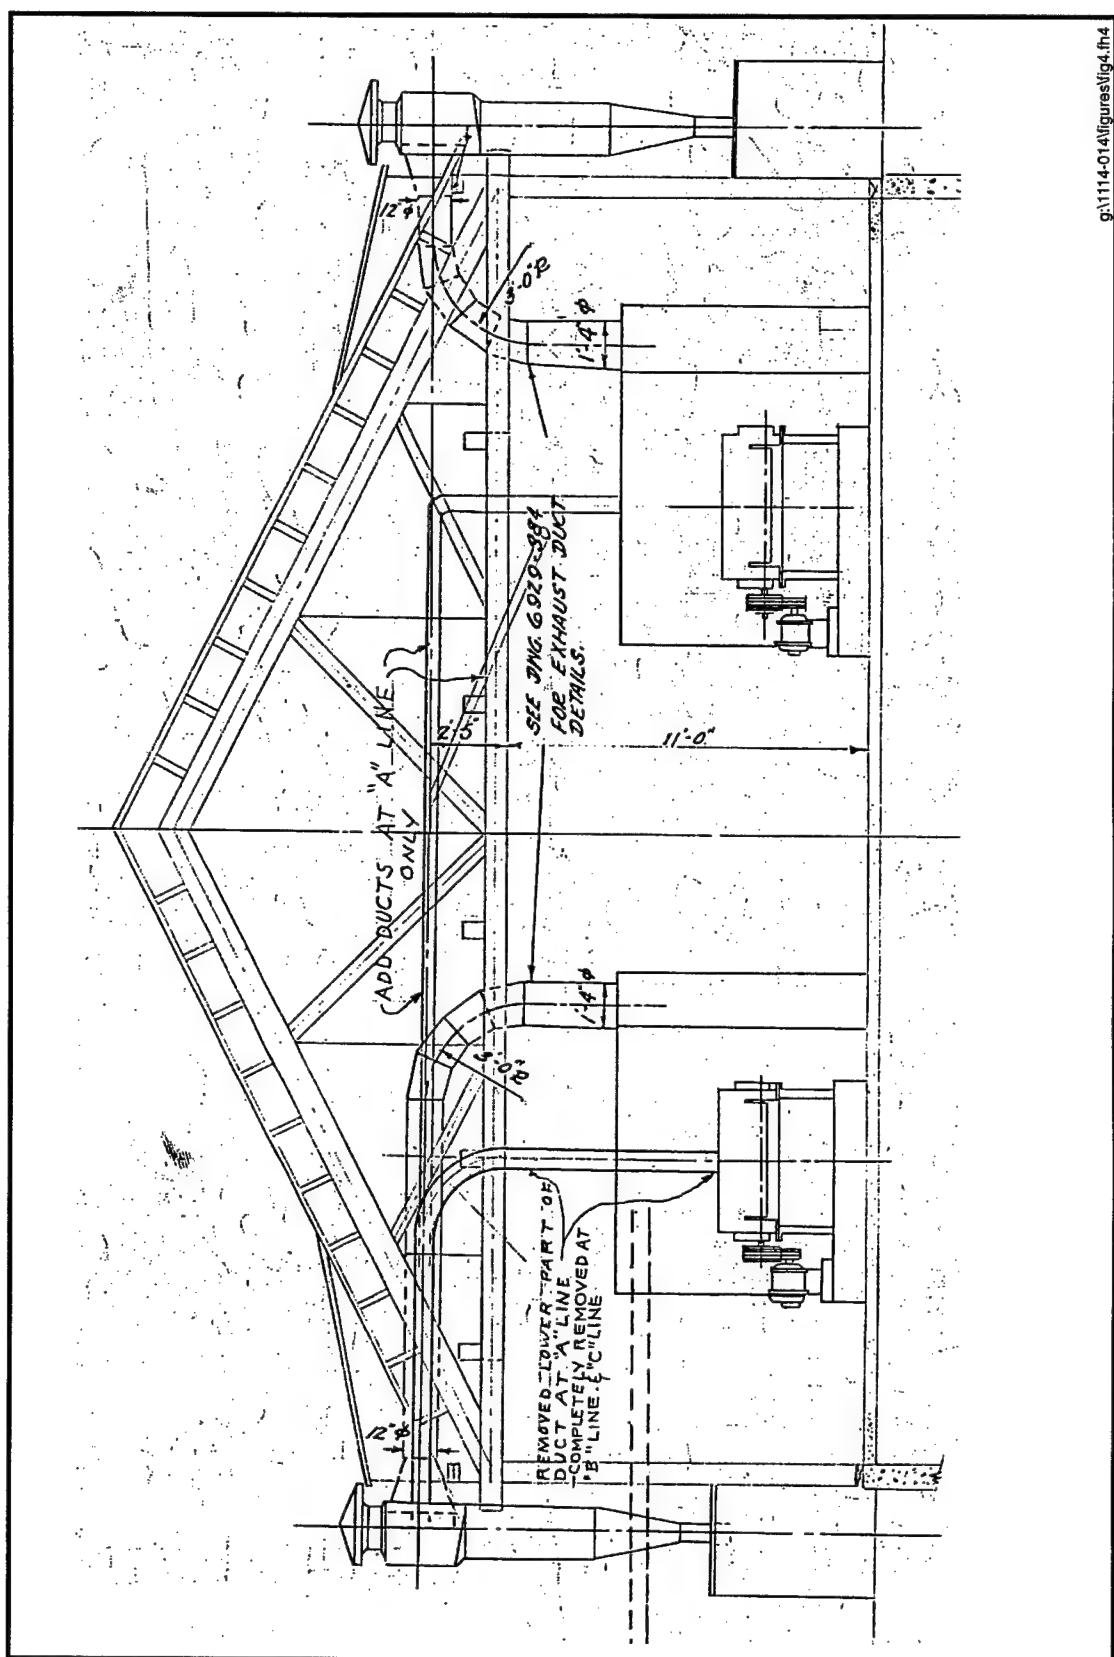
Interior elevation of Building 1010, Cotton Dry House, where cotton or wood pulp was dried and shredded (1940 HPC Drawing #6929-252).
